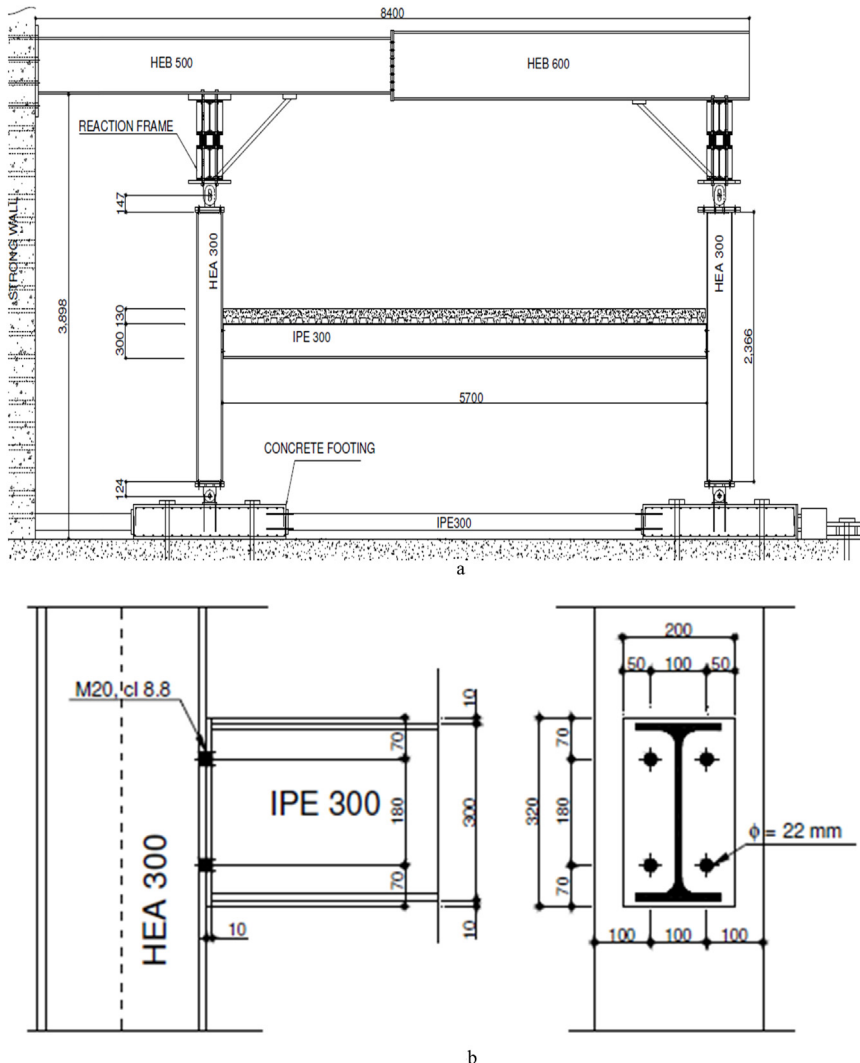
(a) Laboratory test geometry [11]; (b) details of the rigid end plate connection.
